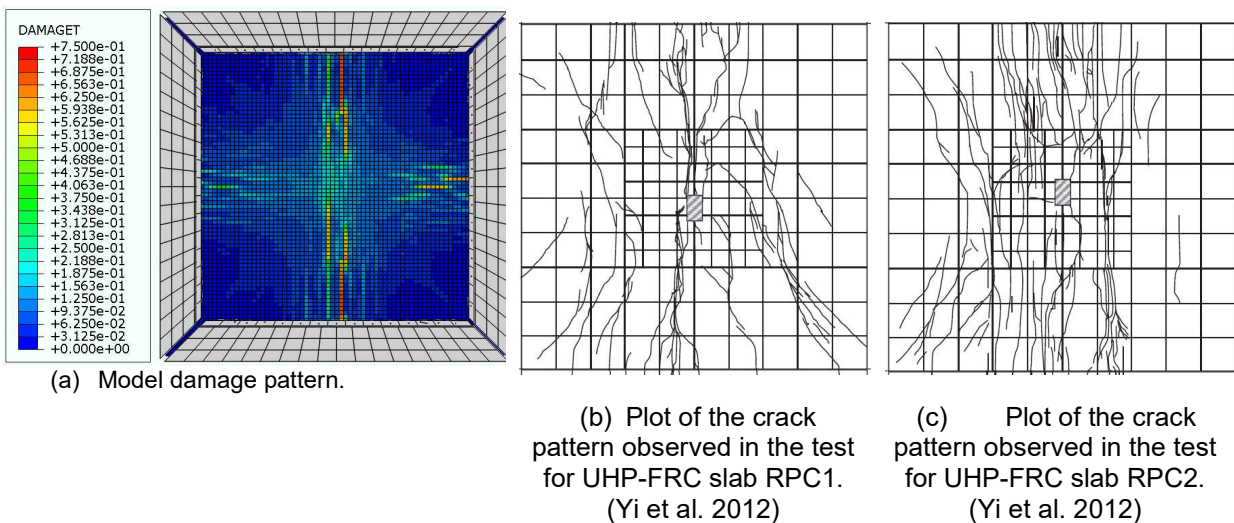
Damage and crack pattern for the UHP-FRC slab.
